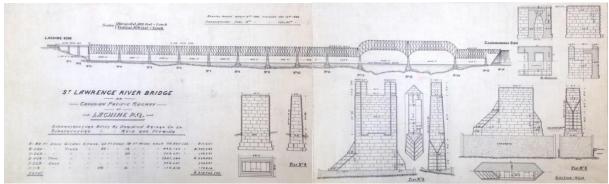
St. Lawrence River Bridge Elevation, [LAC: Dominion Bridge Co. fonds, 86703115, Contract No. 109 #71].
